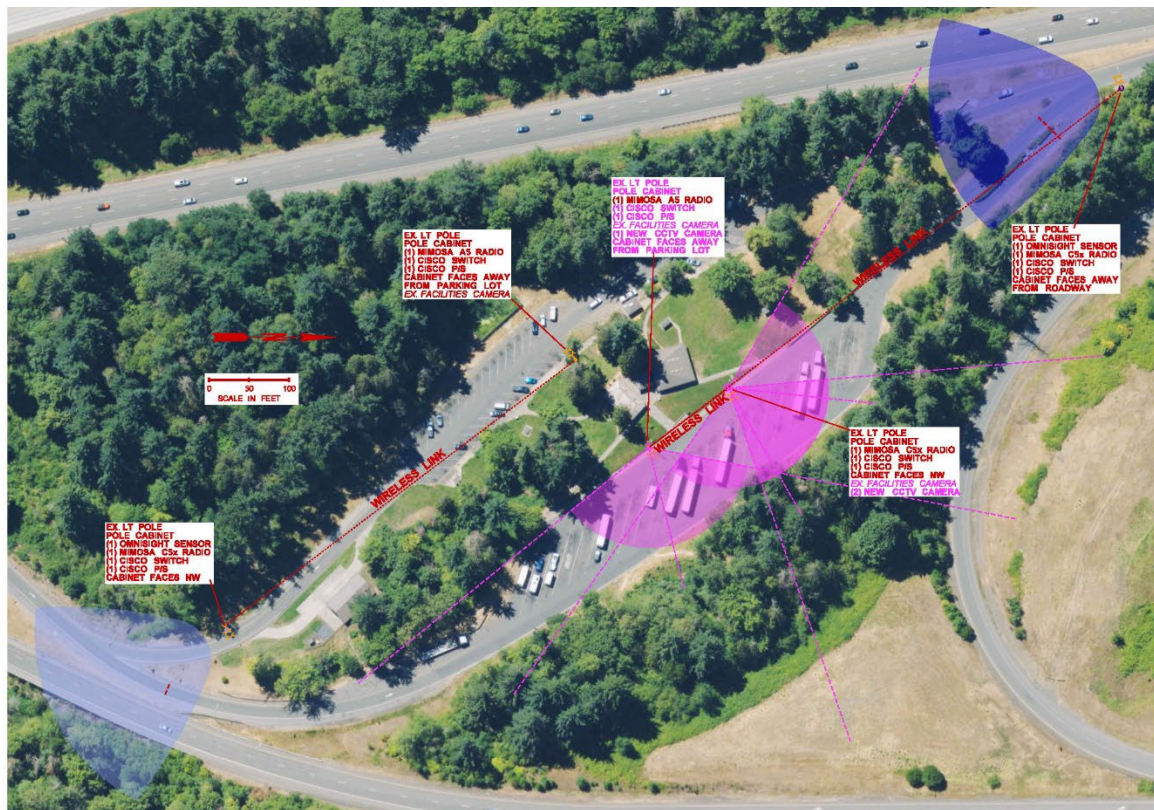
Gee Creek NB plan for sensor and camera installation
